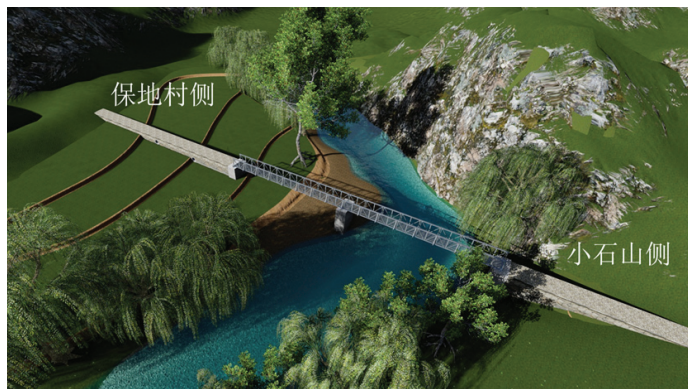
Design sketch of Bailey bridge project in Liuzhu village
